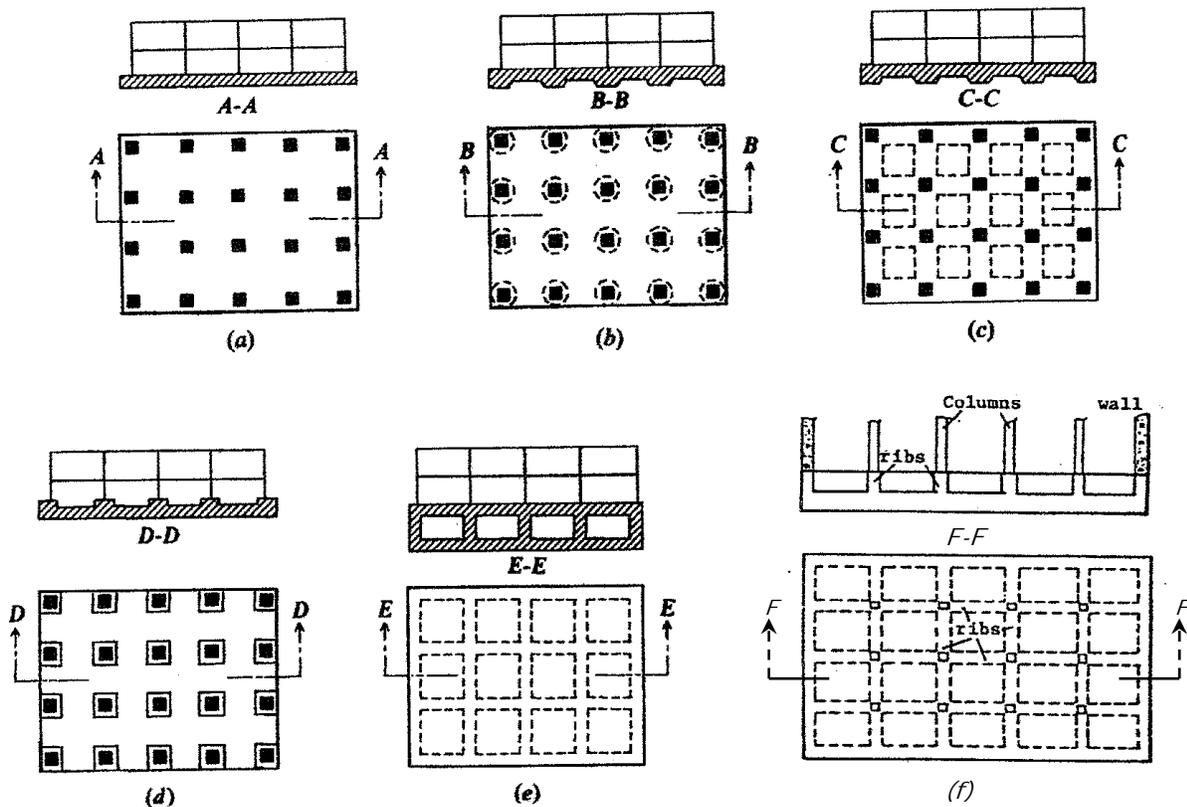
Common types of mat foundations (a) flat plate (b) plates with drop caps (c) waffle slab (d) plate with pedestals (e) cellular slab (f) rib slab
